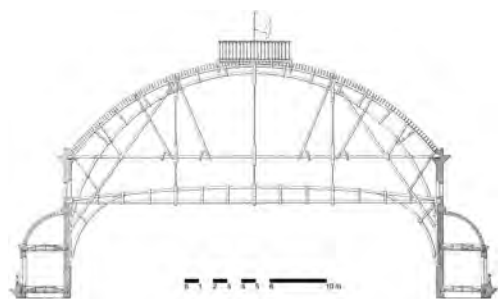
Cross section of a truss of the Théâtre-Français showing the fillings of hollow pots (Eck 1836).
